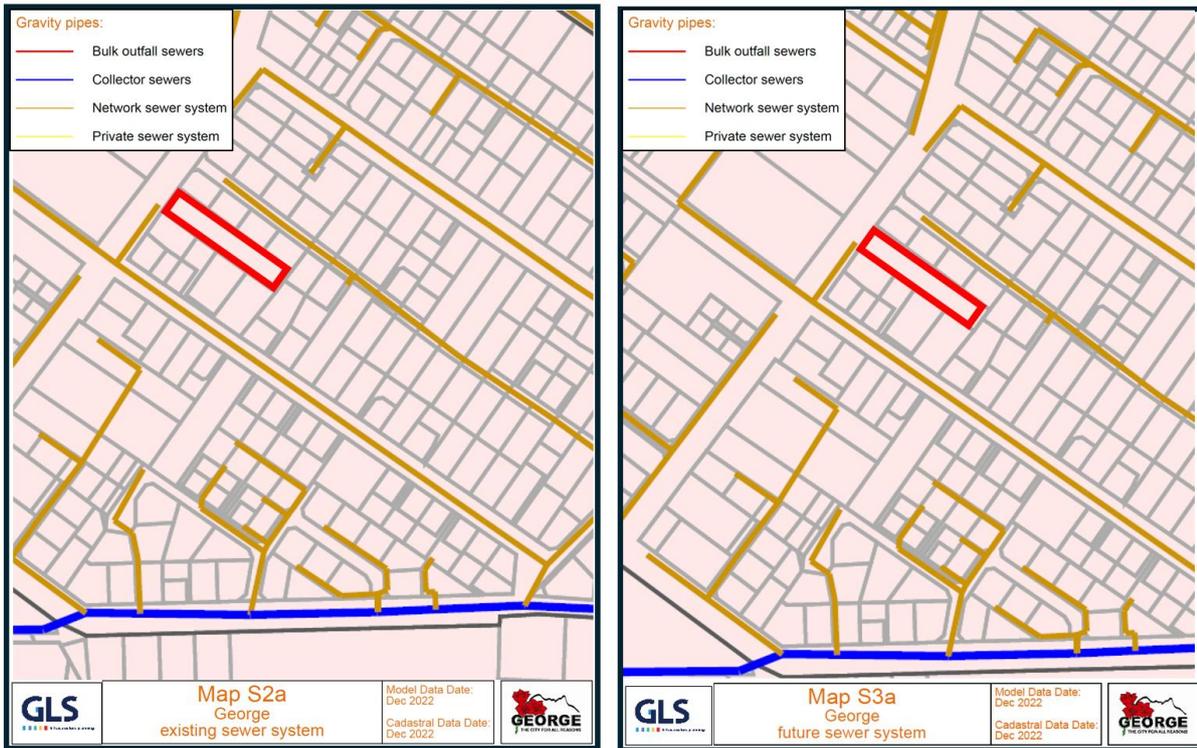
GLS Consulting Existing and Proposed Future Sewer system (No additional sewer infrastructure planned)
